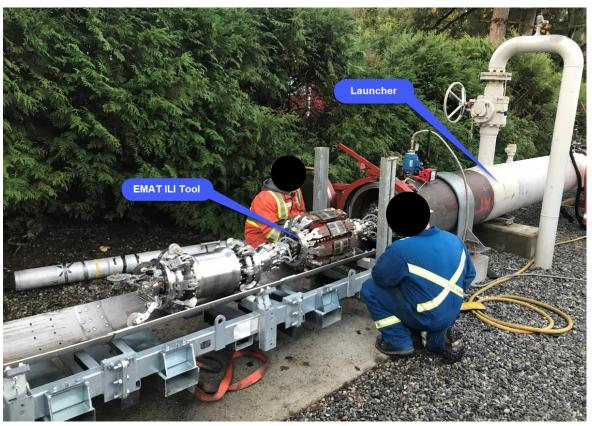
EMAT ILI Tool being Inserted into a Launcher
